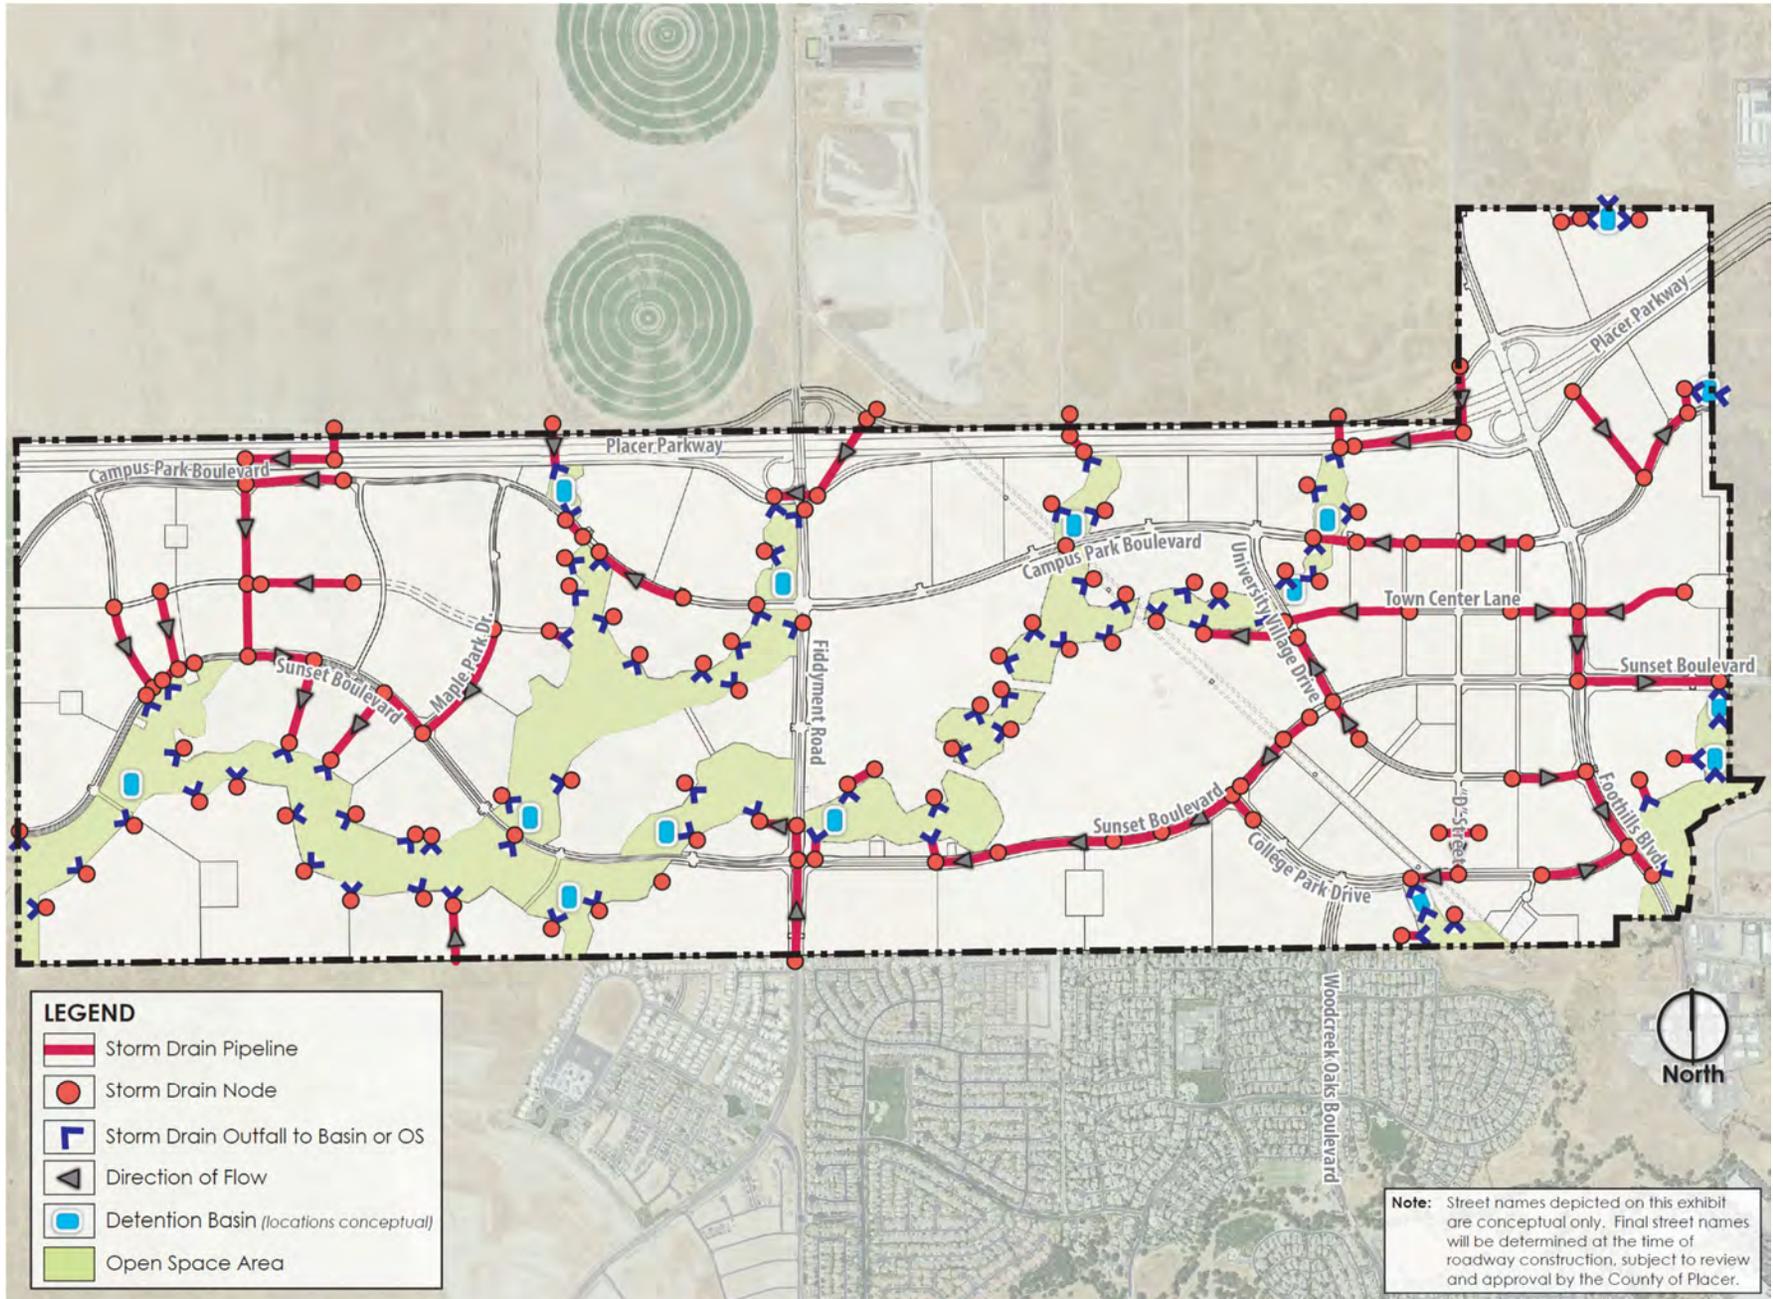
STORMWATER DRAINAGE INFRASTRUCTURE
